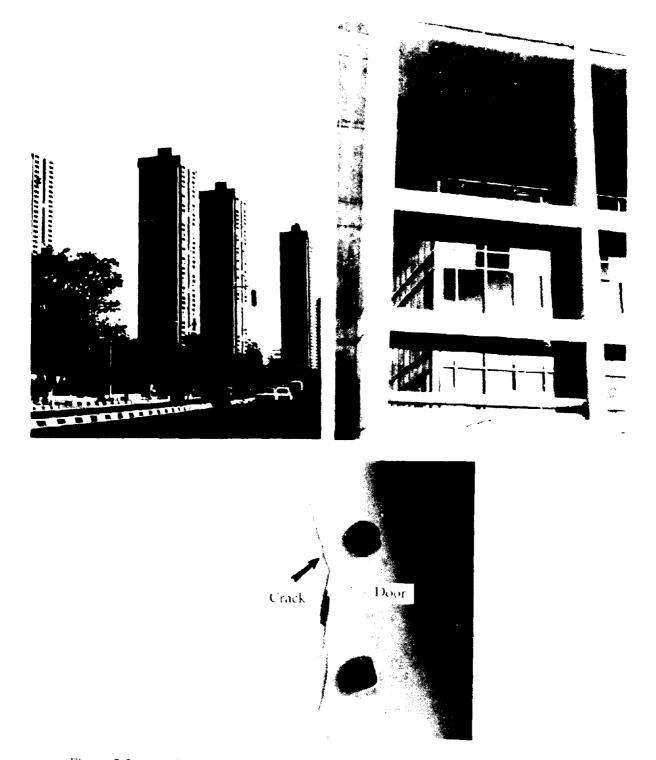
42-story high-rise concrete buildings in Cairo experienced only nonstructural damage.
